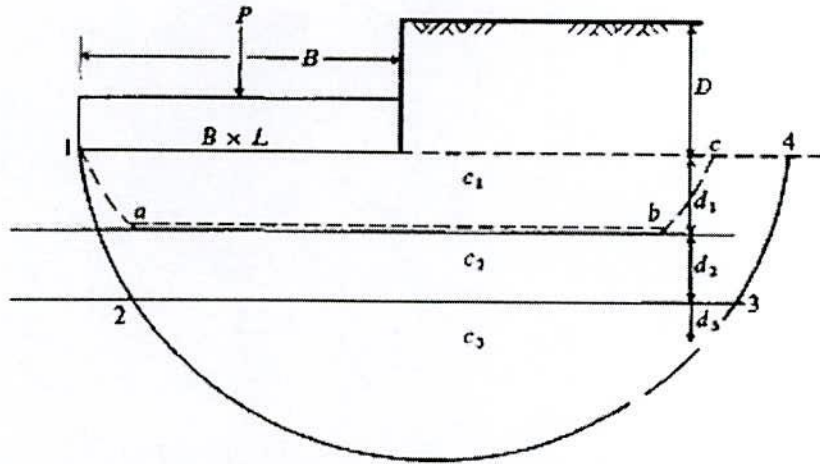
Footing on layered clay soil. For very soft C_1 failure may occur along sliding block abc and not a circular arc and reduce N_c to a value less than 5.14.
